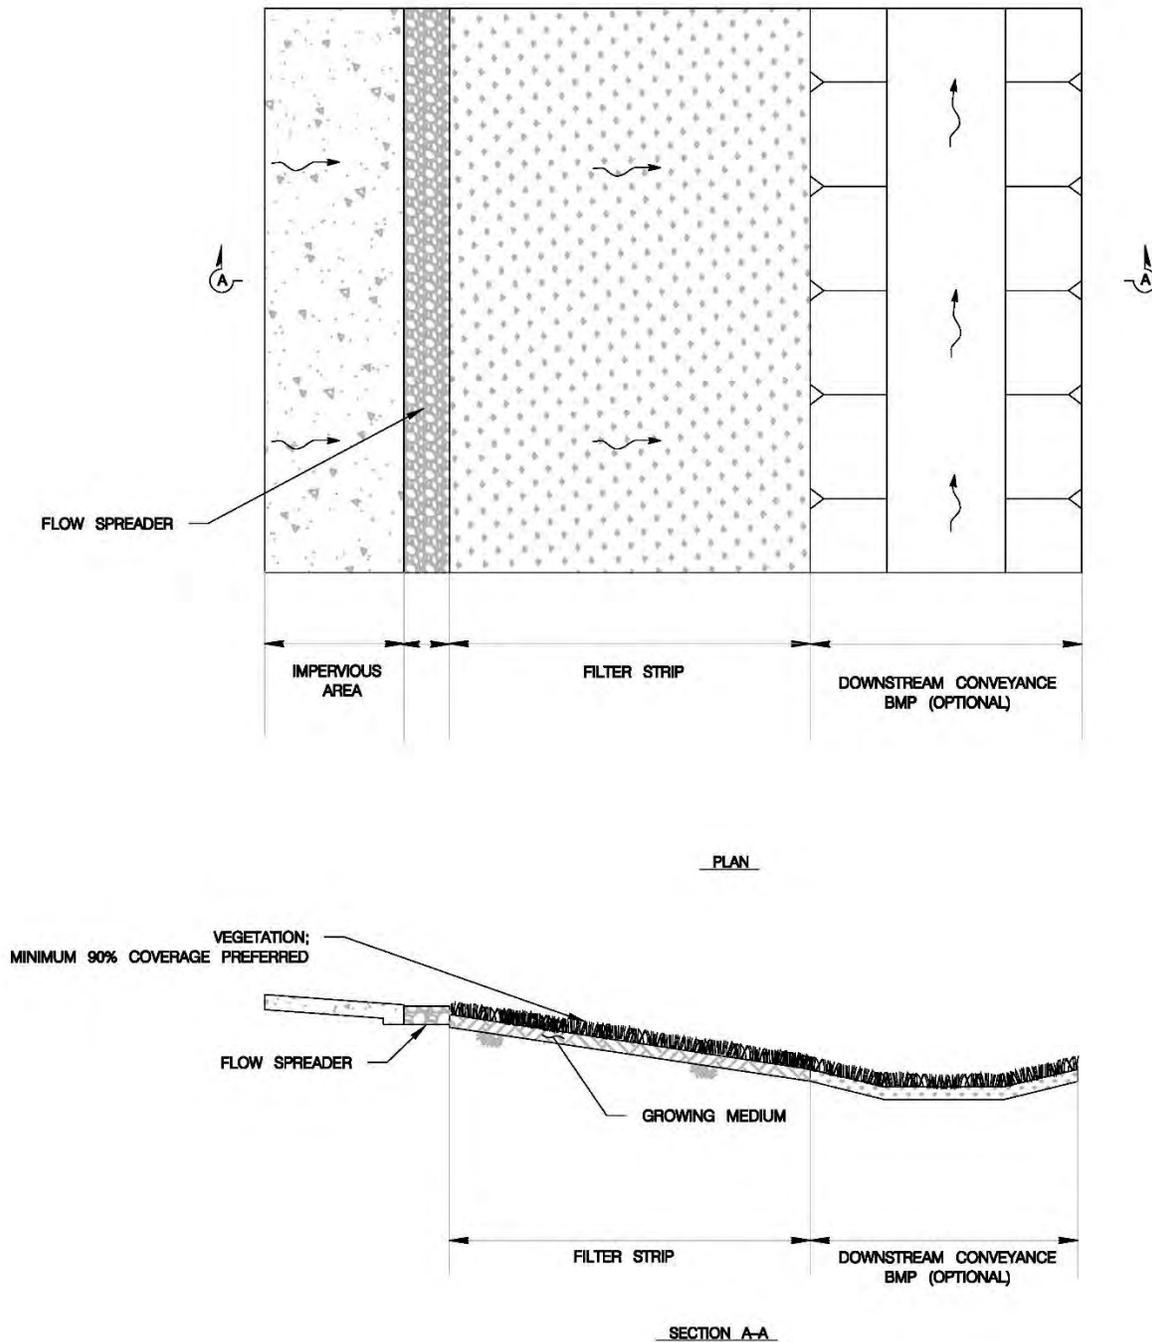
Vegetated Filter Strip Schematic Plan and Section View
